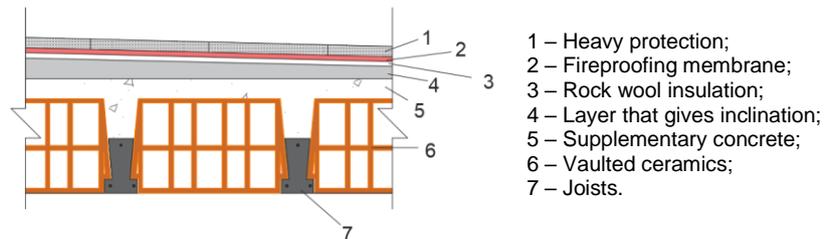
CUT IN THE LONGITUDINAL DIRECTION OF THE TERRACE ROOF. DRAWING WITHOUT SCALE.
